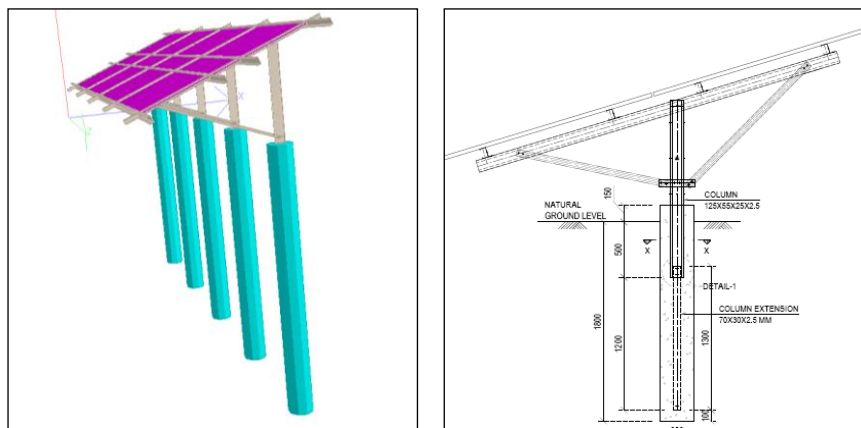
MMS table with foundation: 3D rendered view on left photo and sectional view on right
